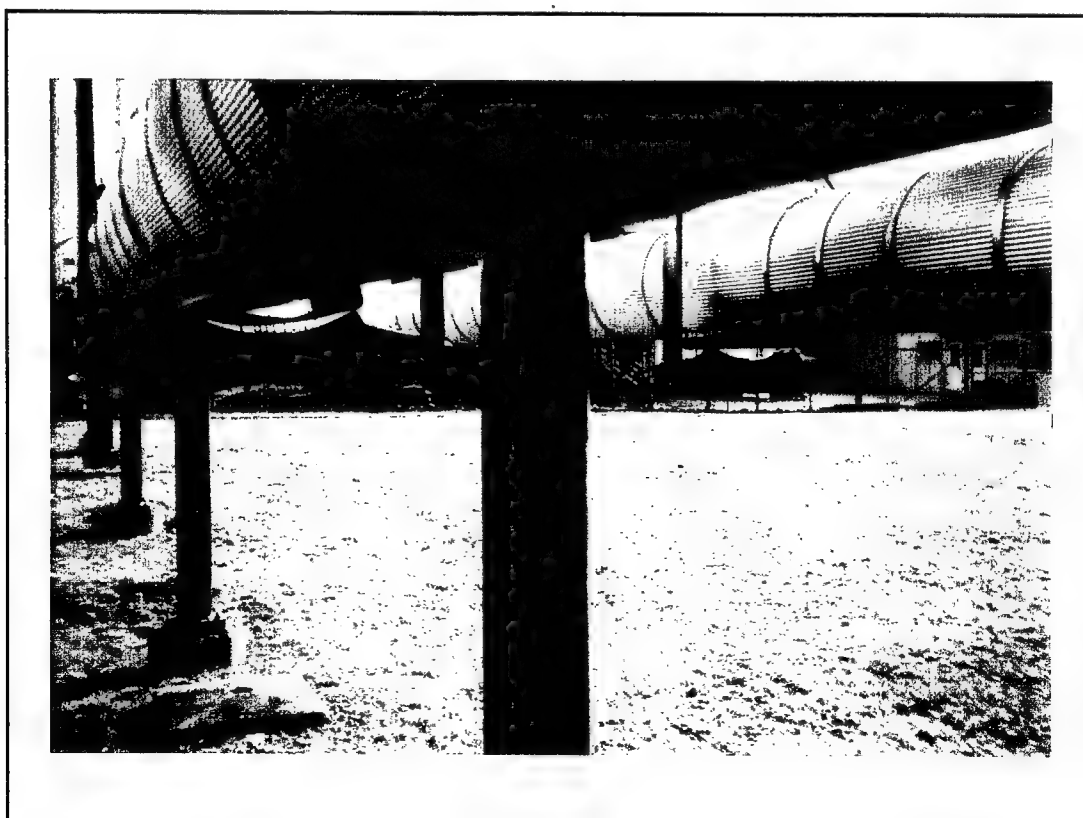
Typical example of pipe not resting properly on support rollers on line to Bldg E3570.
